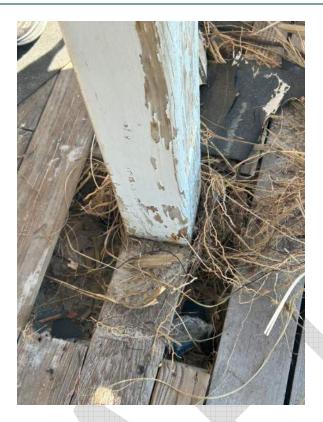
Bottom Section of the Wooden Columns of the Back Porch.
